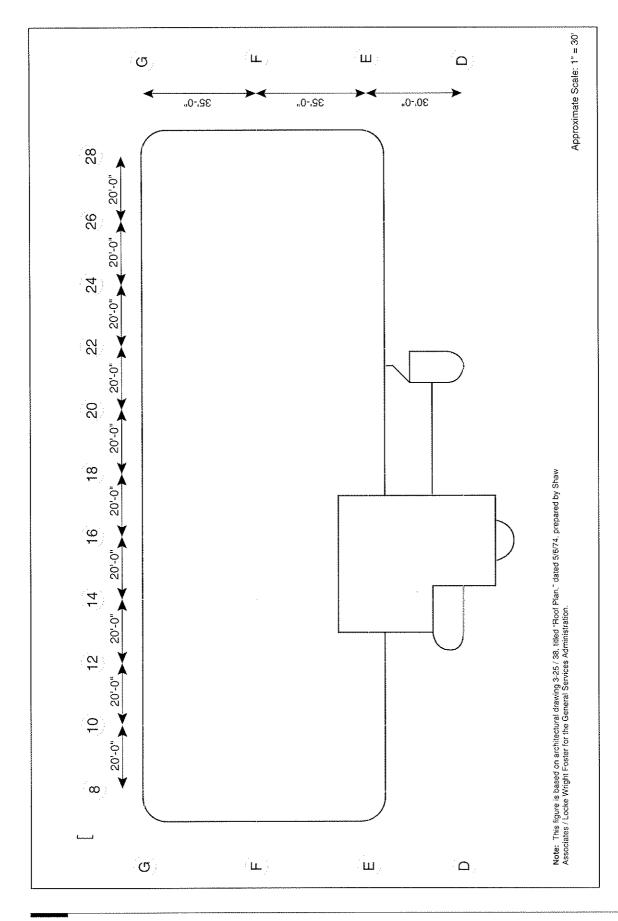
Roof plan – nine-story portion of Murrah Building.
